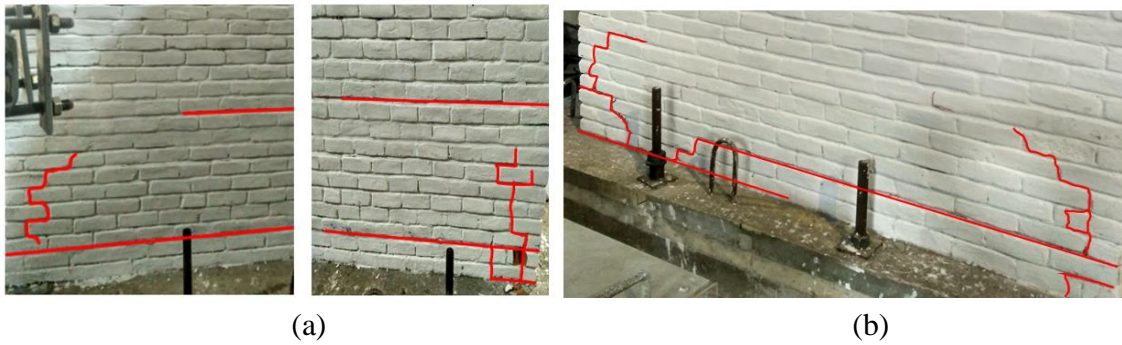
Cracks in the out-of-plane walls [a) east wall b) west wall]
